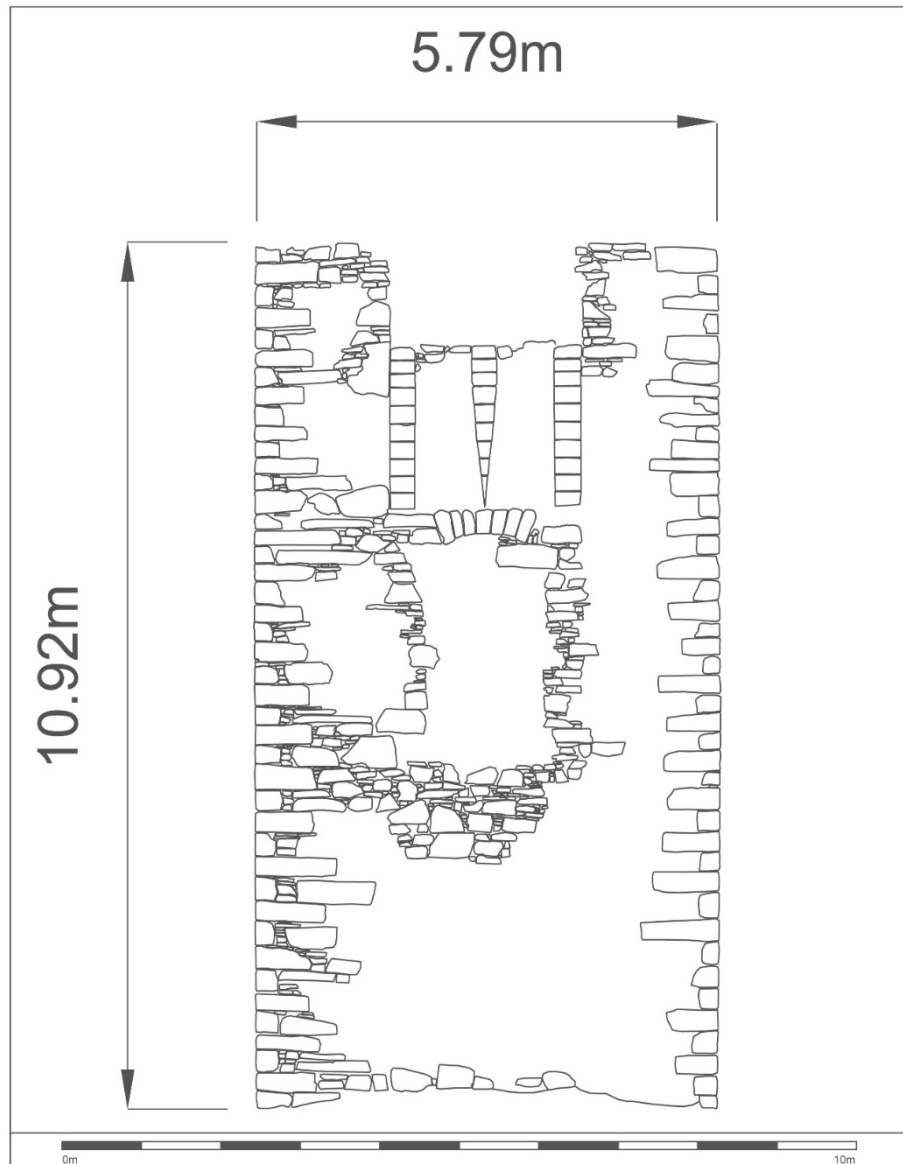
External elevation of the north-west wall of the signal tower at Crohy Head Signal Station.
